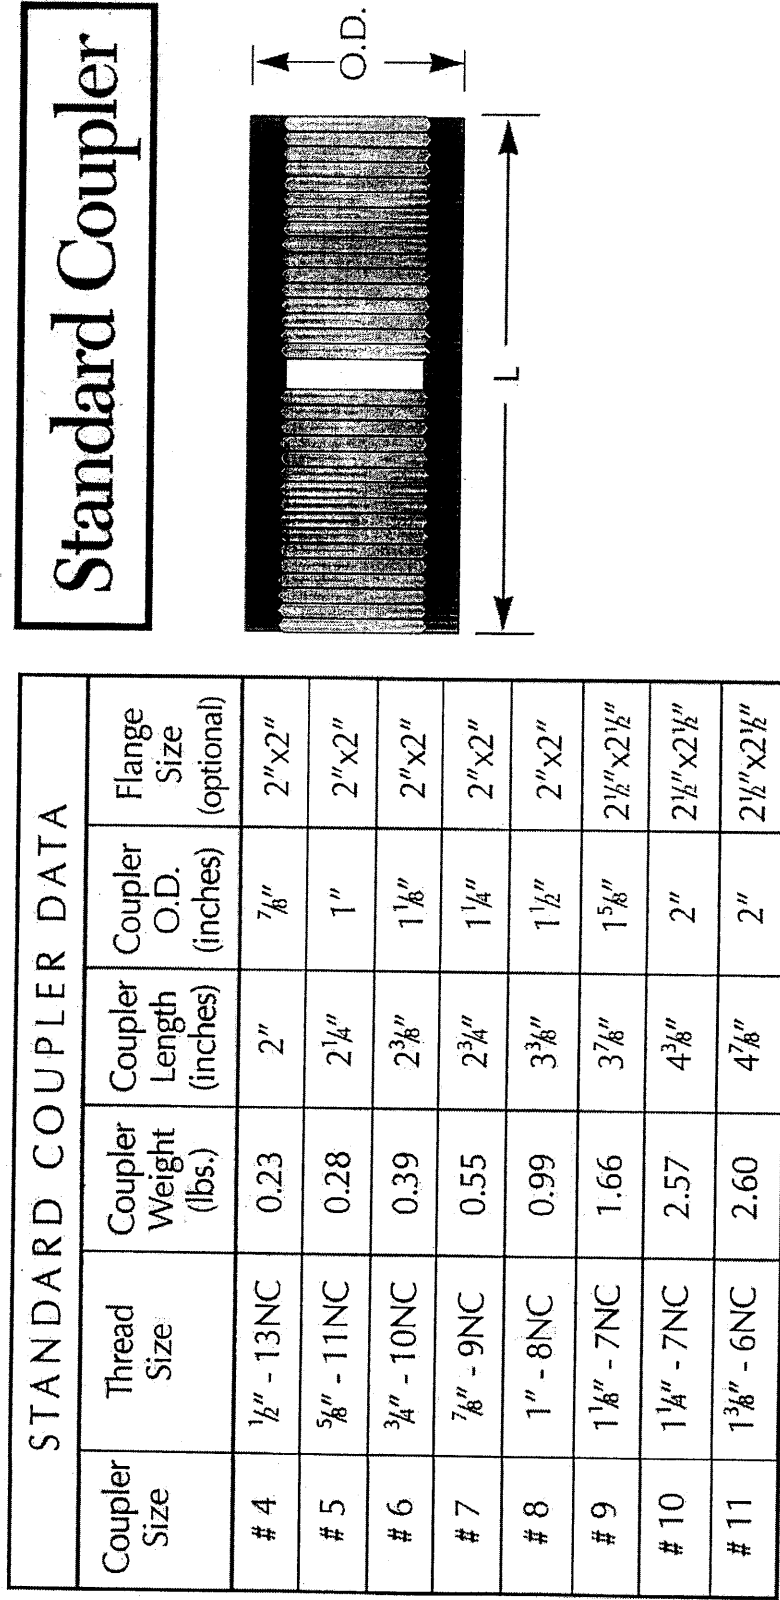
Specified Sleeve Dimensions for EDC Standard Couplers
